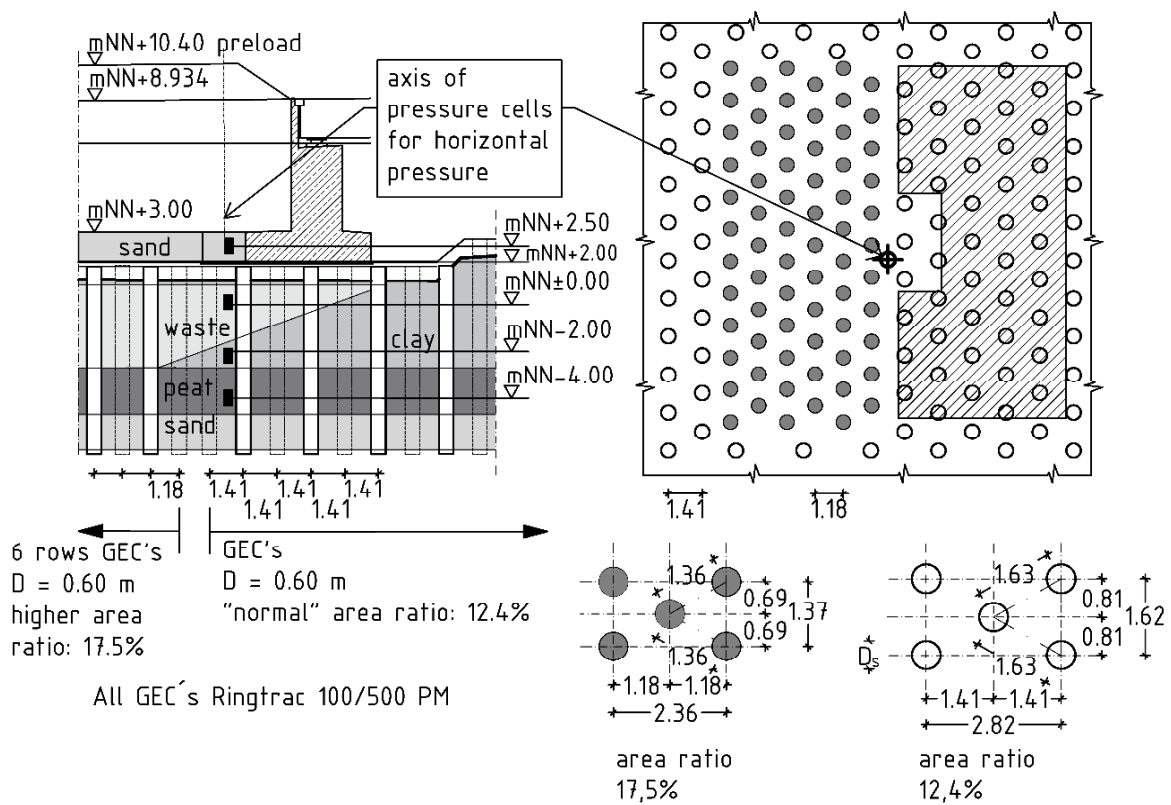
Simplified overview of the GEC foundation adjacent to the Northern bridge abutment; all dimensions in meters; “mNN” means height above mean sea level in meters
